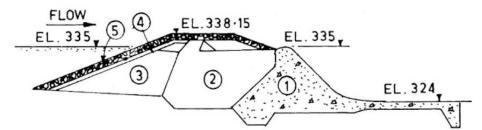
Fuse plug spillway - typical cross-section [7] 1 – Concrete dam; 2 – clay core; 3 – sandy gravel; 4 – gravel filter; 5 – riprap
